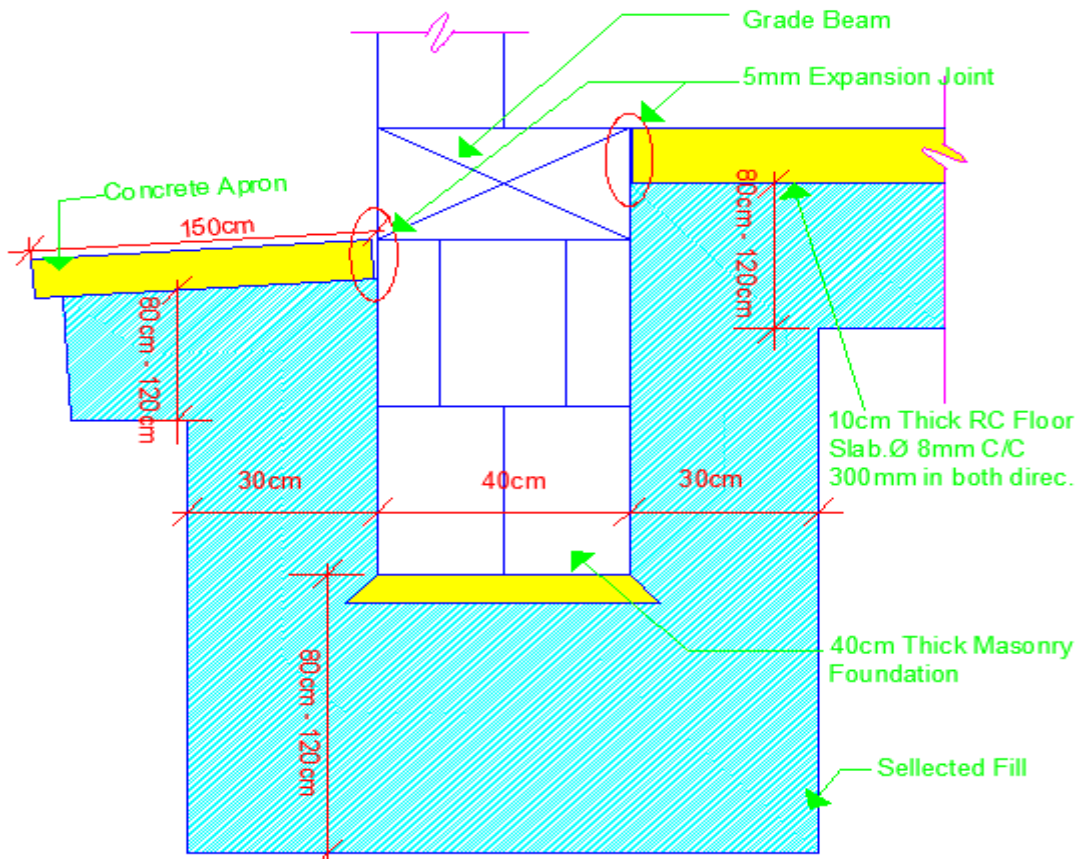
Proposed peripheral masonry foundation detail for the study area
